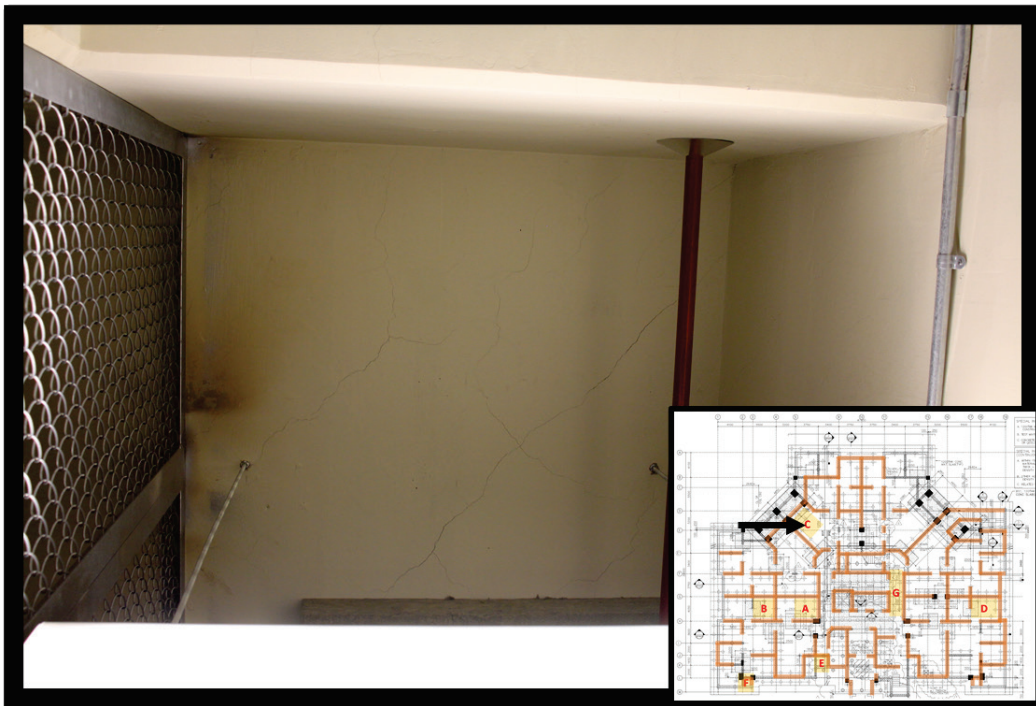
Slab floor cracks within the Tower 1 basement storage area (Section C of the floorplan insert). The widest observed crack width was less than 0.25 mm.
